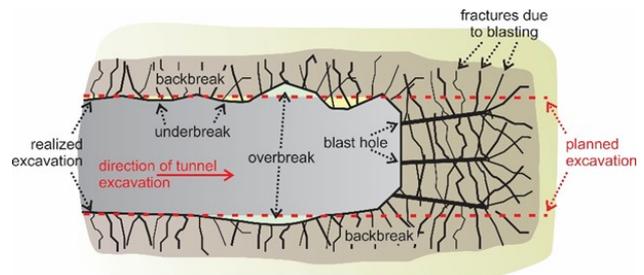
Discontinuities in a groundmass due to blasting and present as backbreak in the walls, roof, and floor of a tunnel give access for weathering agents
